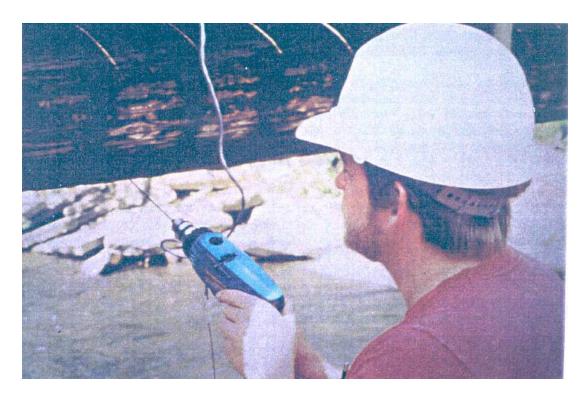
Drilling of the wood beam in preparation for the shigometer probe.
